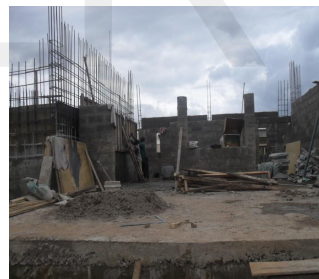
STAGE OF CONSTRUCTION AT SITE B
